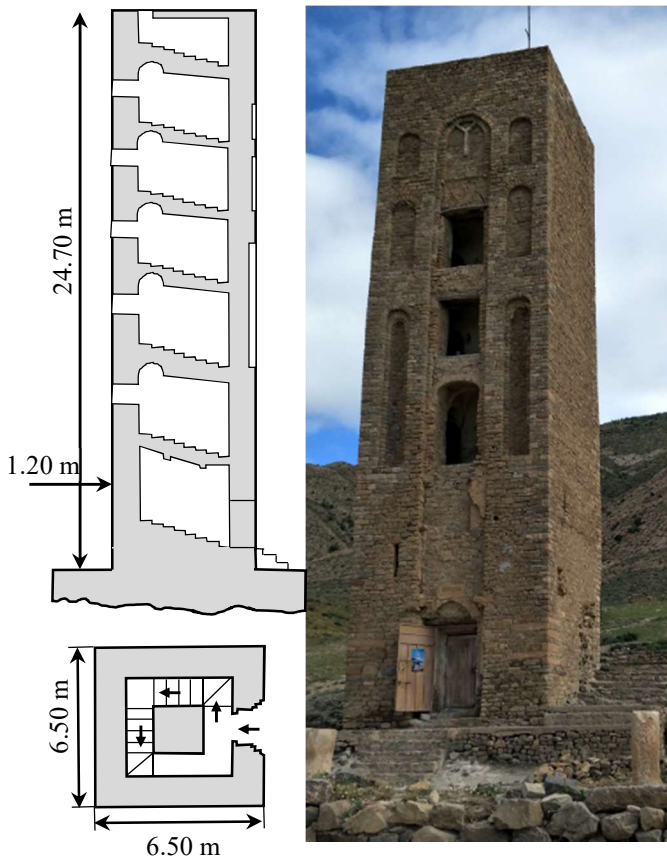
Global view, layout and elevation sections of Kalaa beni-Hammad.
